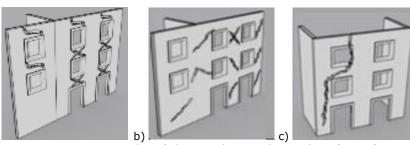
Most common in-plane failure mechanism due to shear forces for masonry buildings: a) damage to spandrels; b) damage to piers; c) global in-plane damage [191]
